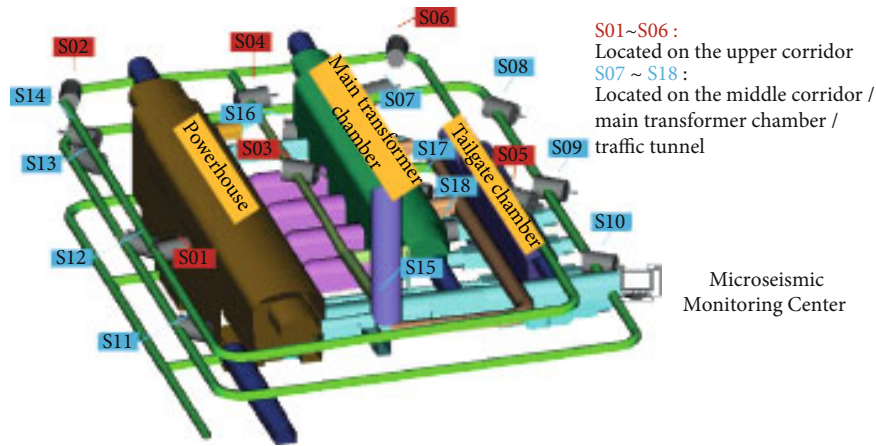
Schematic diagram of sensor layout in underground powerhouse area.
